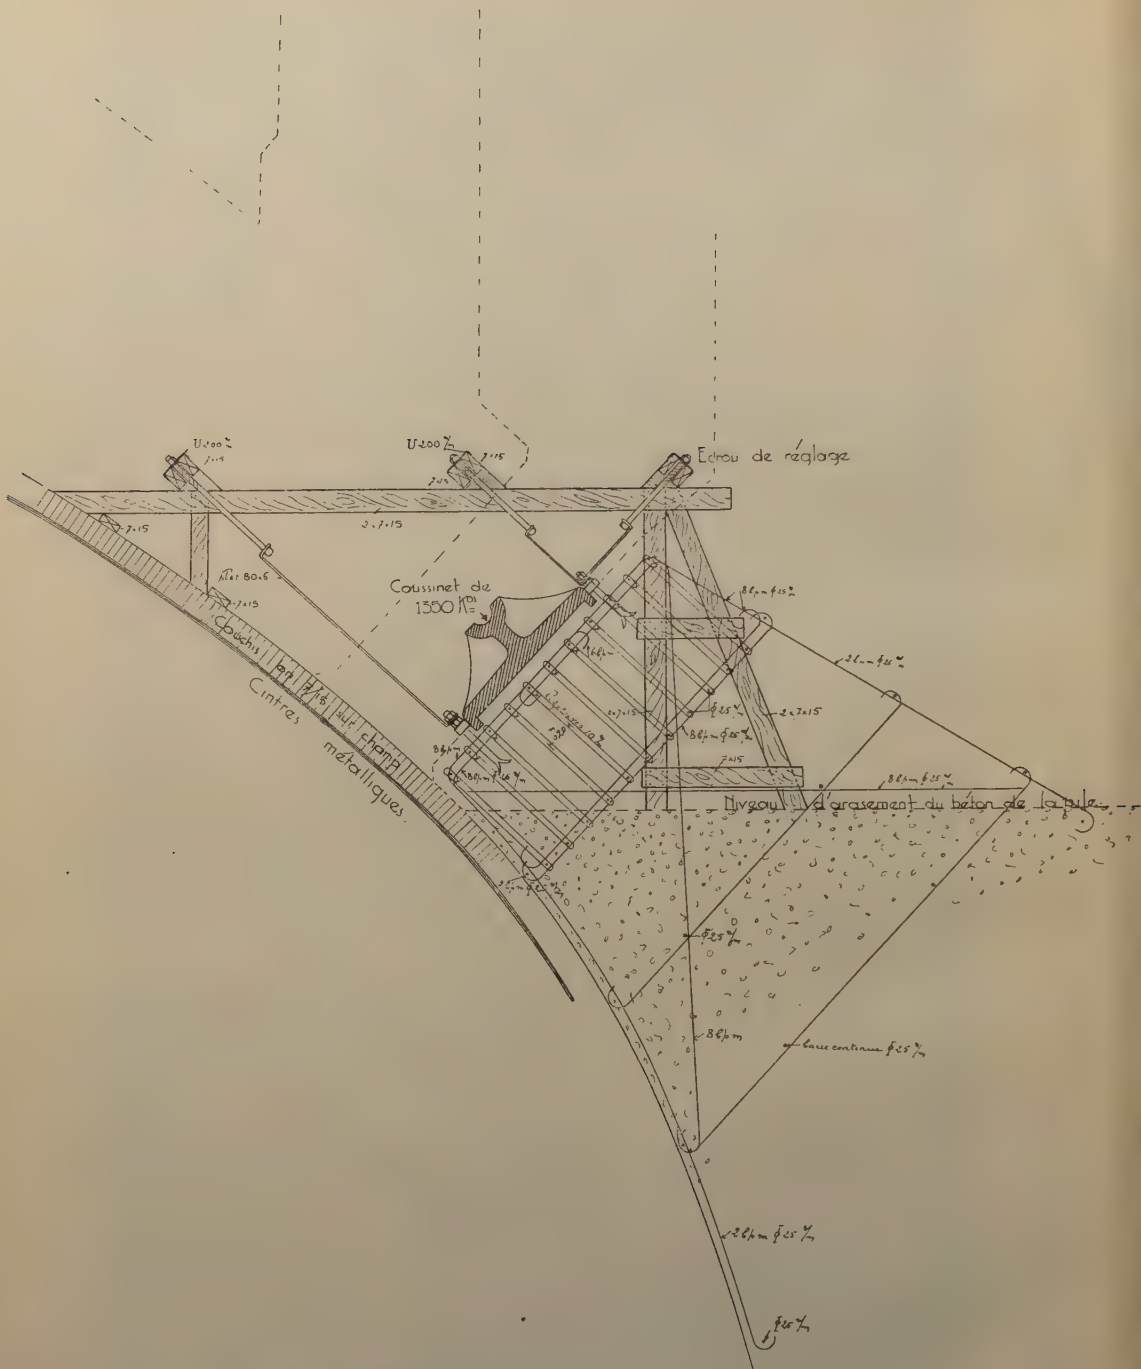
Diagram of the adjusting device for the hinge bearings.
